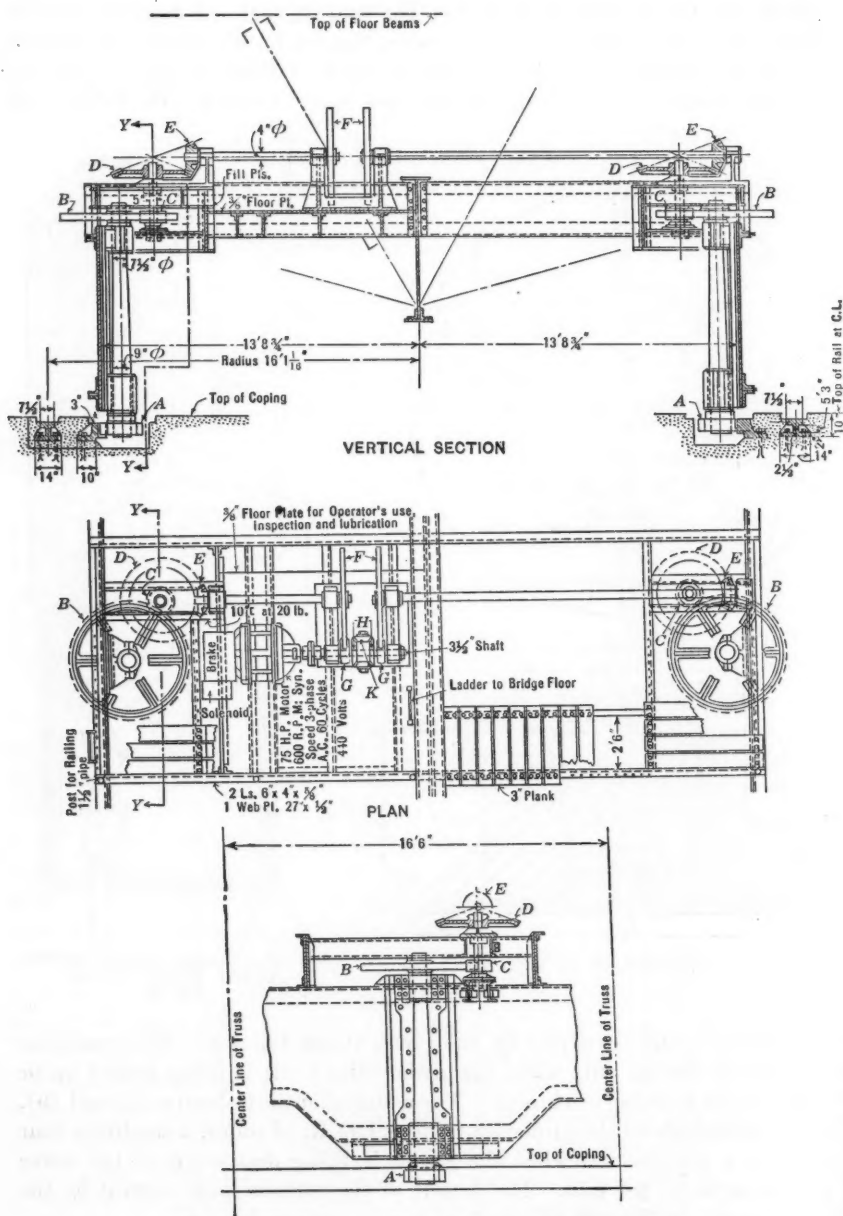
DETAILS OF MACHINERY FOR TURNING BRIDGE.
